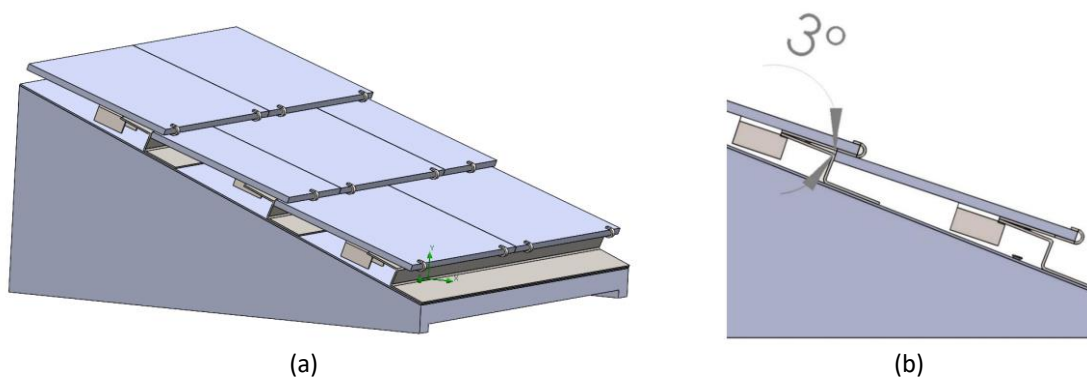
The batten (a) isometric view (length 600 mm) and (b) front view with dimensions
